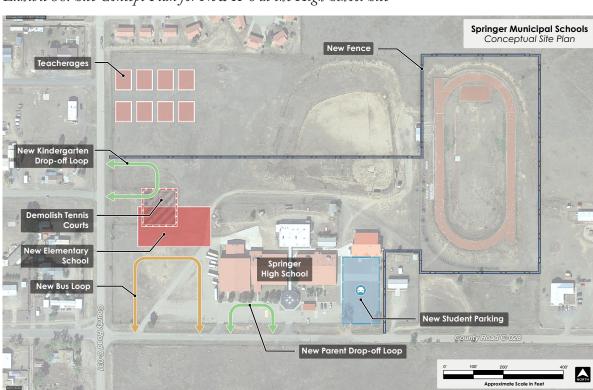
Site Concept Plan for New K-6 at the High School Site
